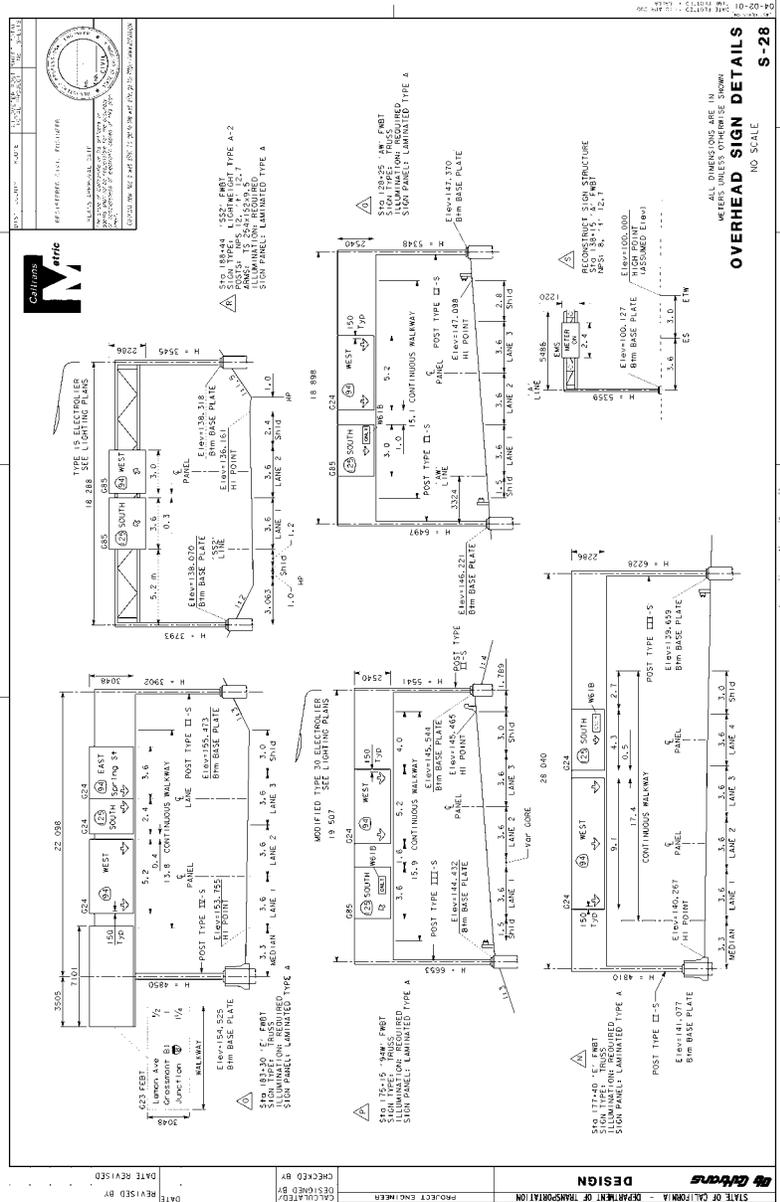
A project plan sheet with a detailed elevation view. This example has rounded off the sign panel lengths to one tenth meter, which can create some confusion when Standard Plans dimensions have not been rounded off.
